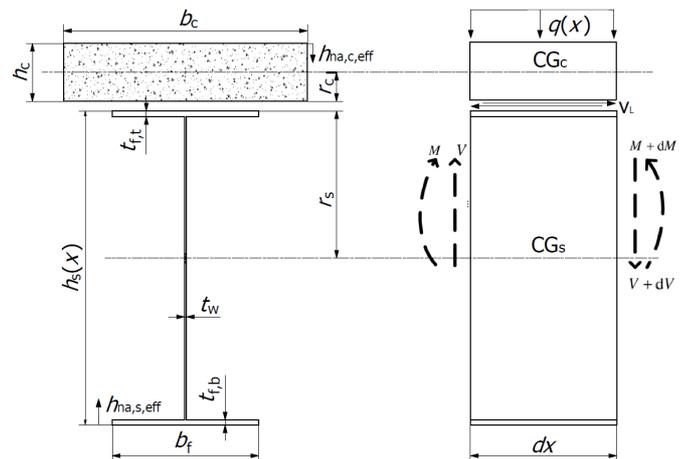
Definition of cross-sectional parameters of steel beam and concrete deck, acc. to [1][2]
